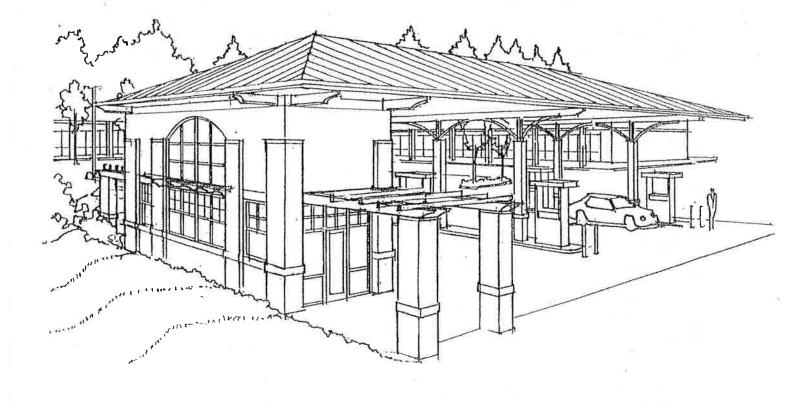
EXHIBIT G: Fuel Station (looking southwest from SR 525)
